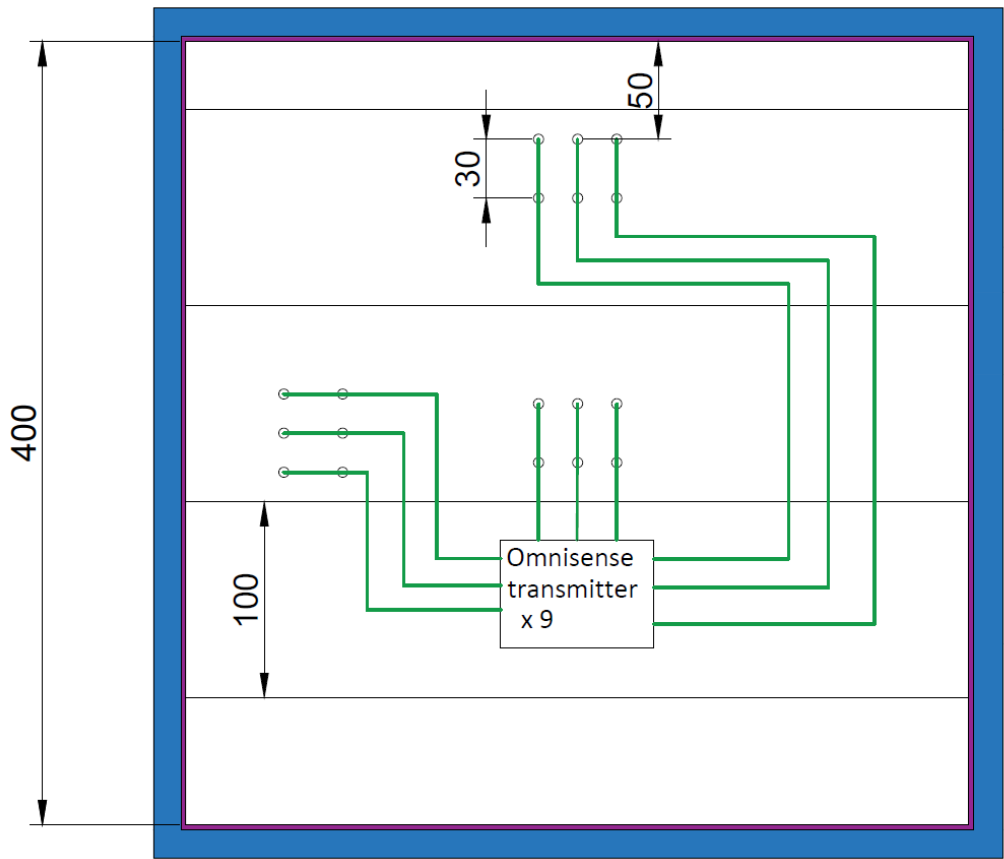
Measuring schema and equipment layout for samples with covered edges (top view); blue - water with dye, purple - waterproof mastic and tape, green - cables, measurements are given in mm
